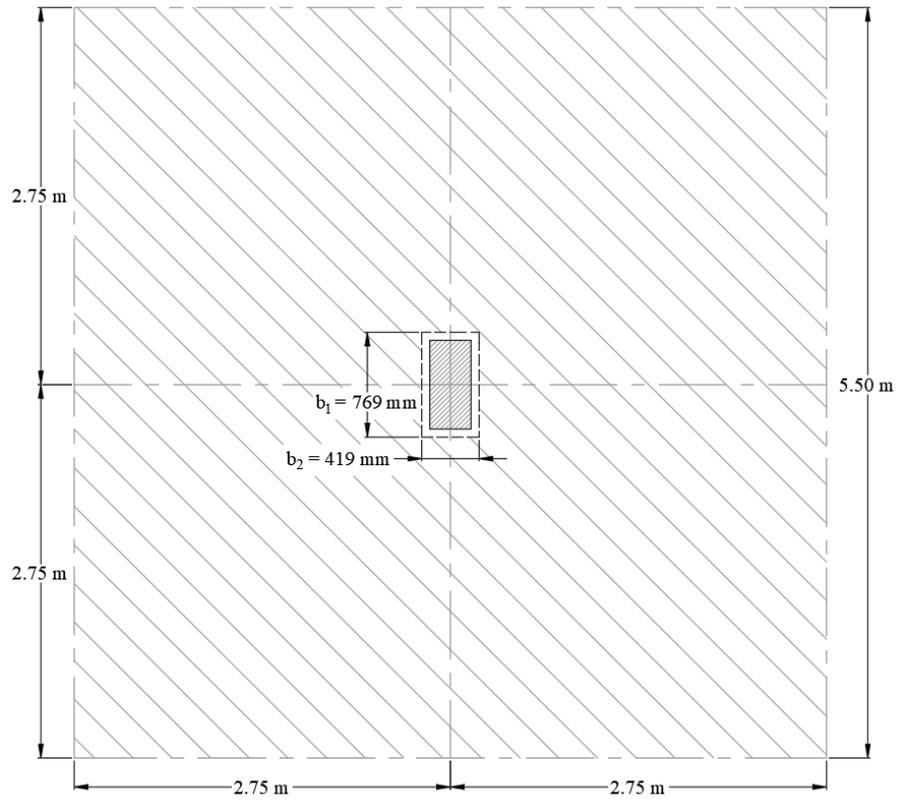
Critical Section for Two-Way Punching Shear (Slab without Opening)
